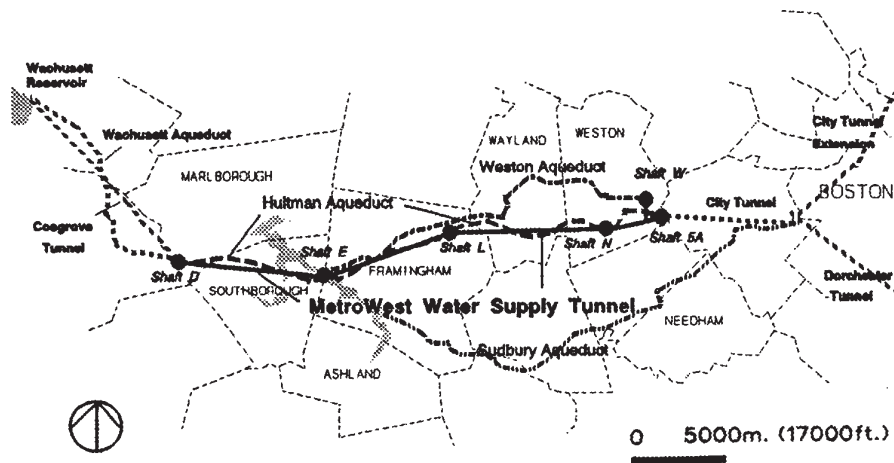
Existing transmission system and proposed MetroWest Water Supply Tunnel
